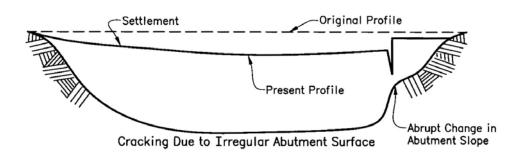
, on the following page, shows how transverse cracks form in an embankment dam.
